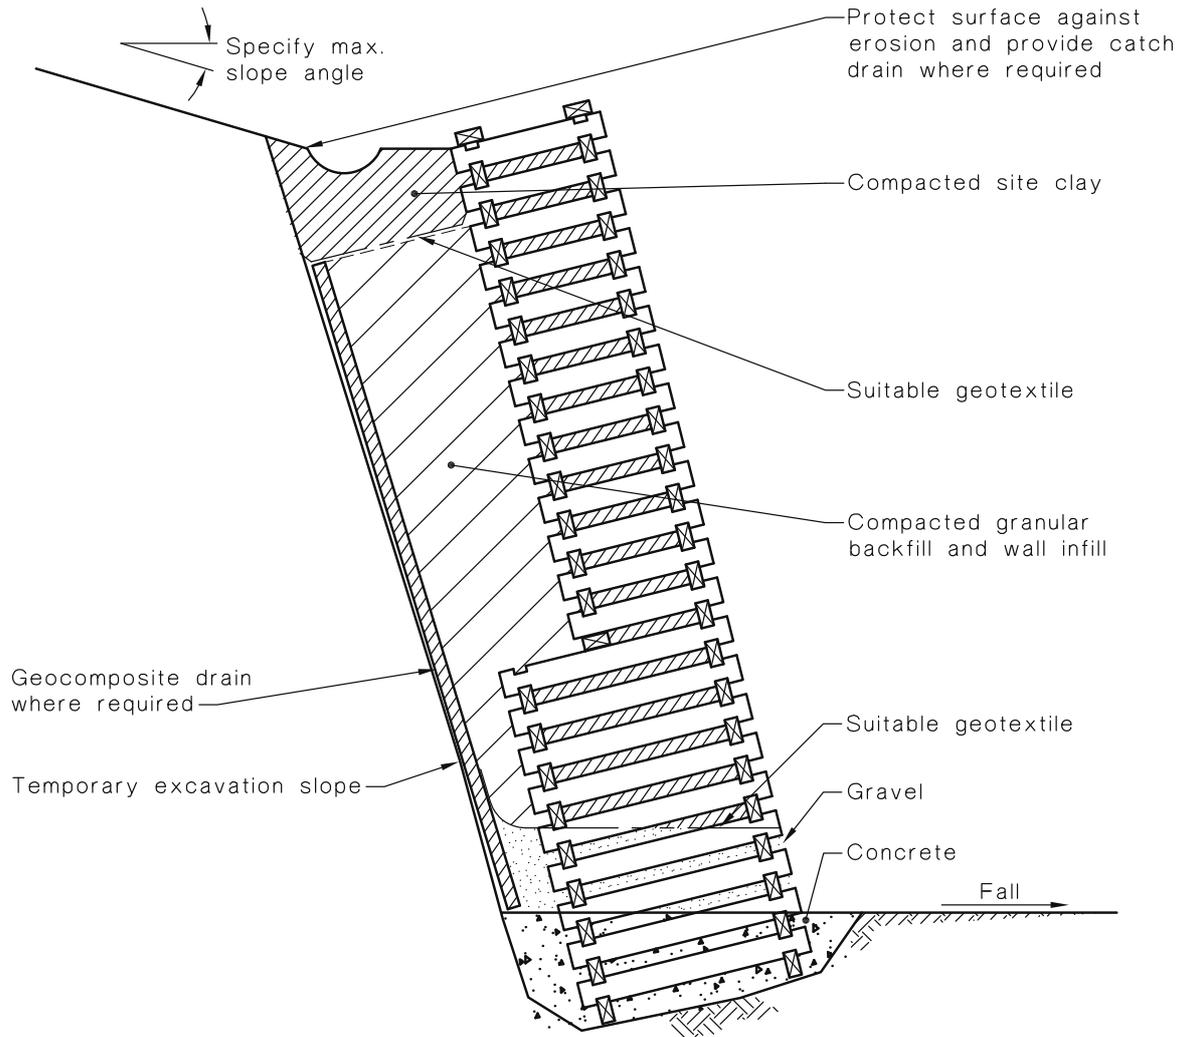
TYPICAL SECTION—CRIB WALL DRAINAGE
